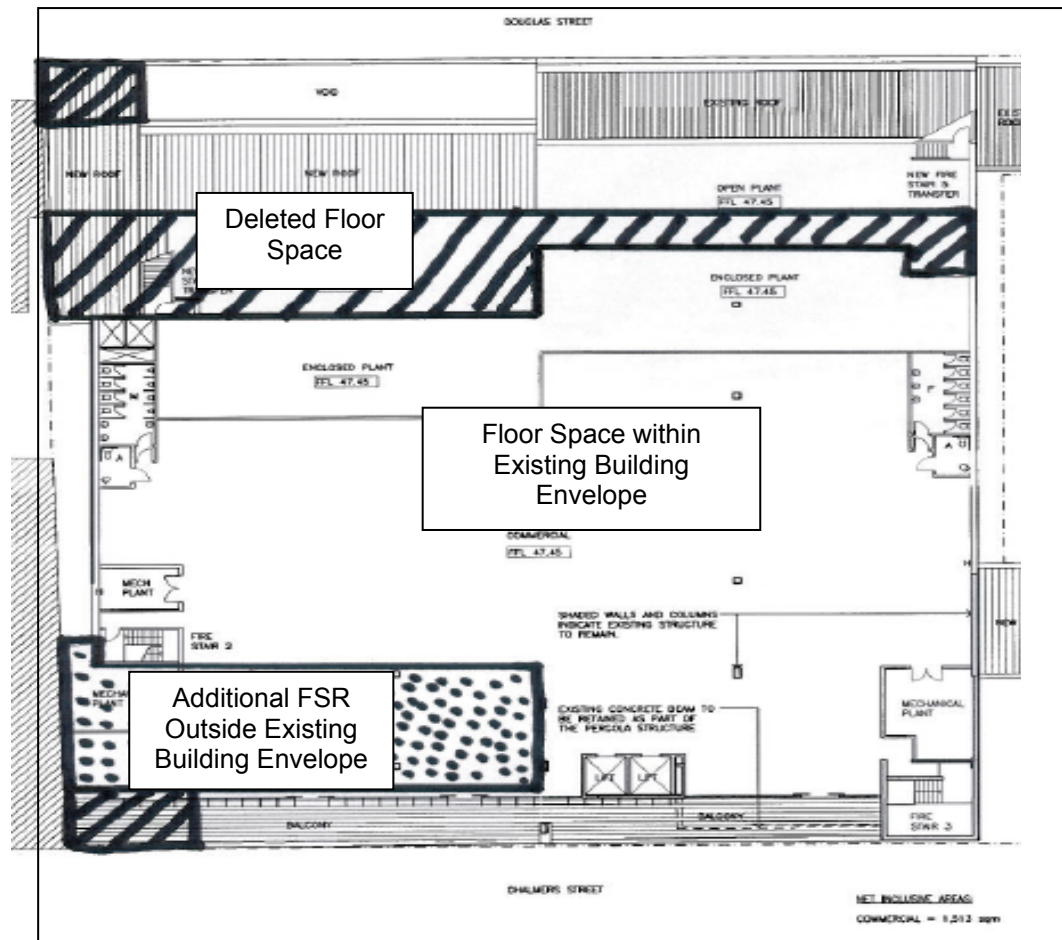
Level 4 Floor Plan Showing Location of New Floor Space & Areas Where Additional Floor Space
